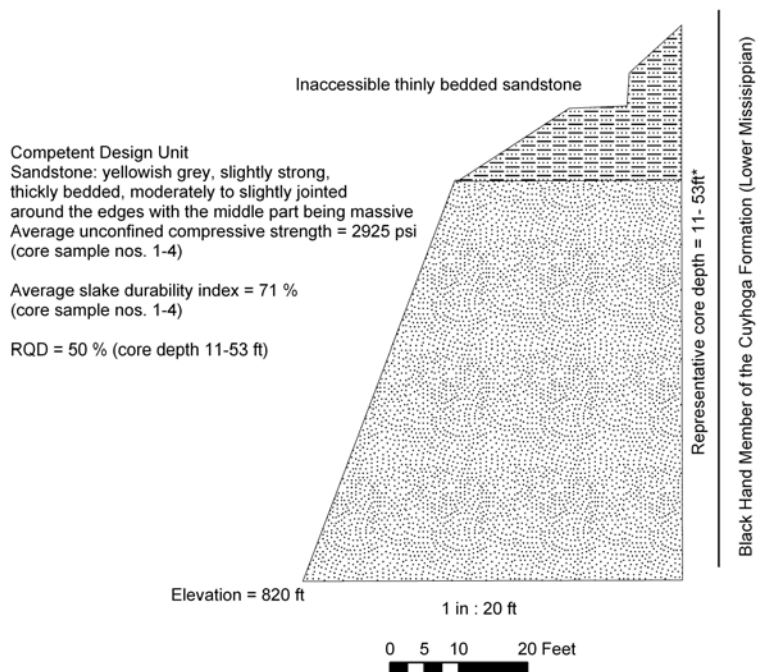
Example of a stratigraphic cross-section for a slope comprised of entirely competent rock unit (LIC-16-28 site).
